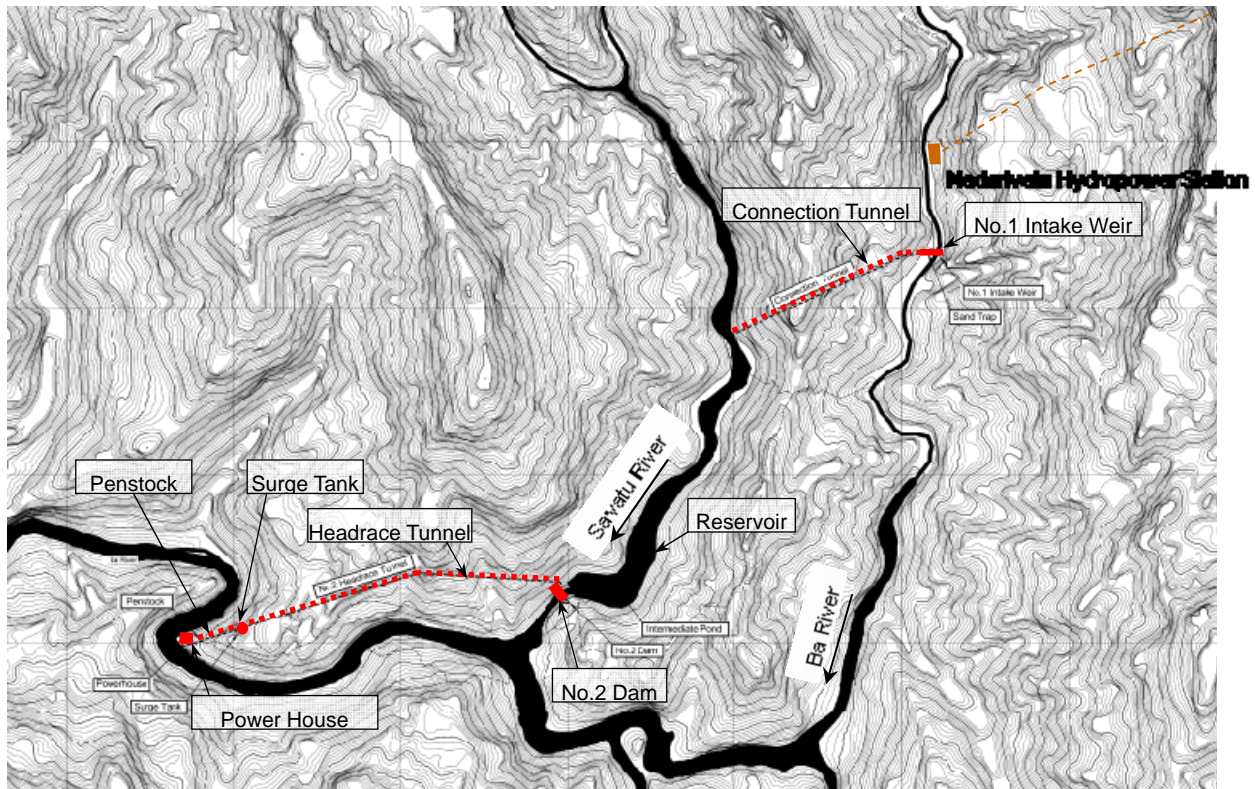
General Layout Plan for No.8 Mba 1 U/S Hydropower Scheme
